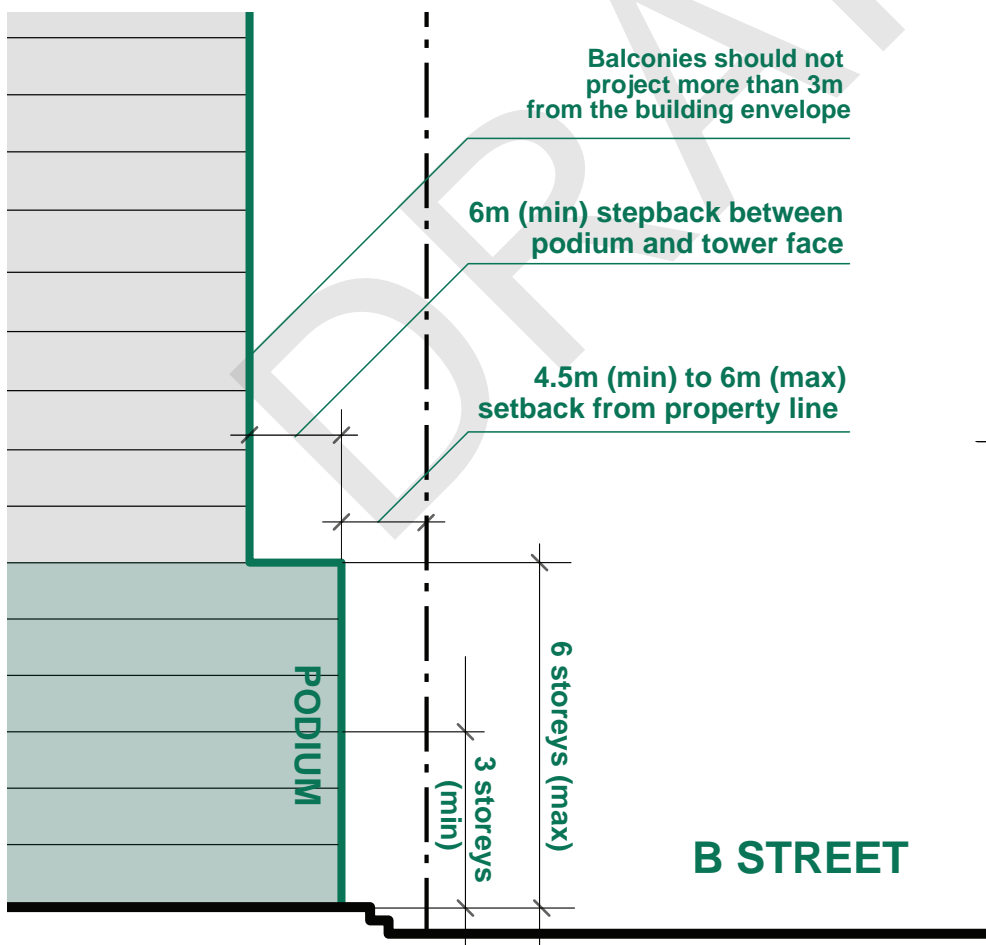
Frontage on a B Street with the required setbacks and stepbacks.
